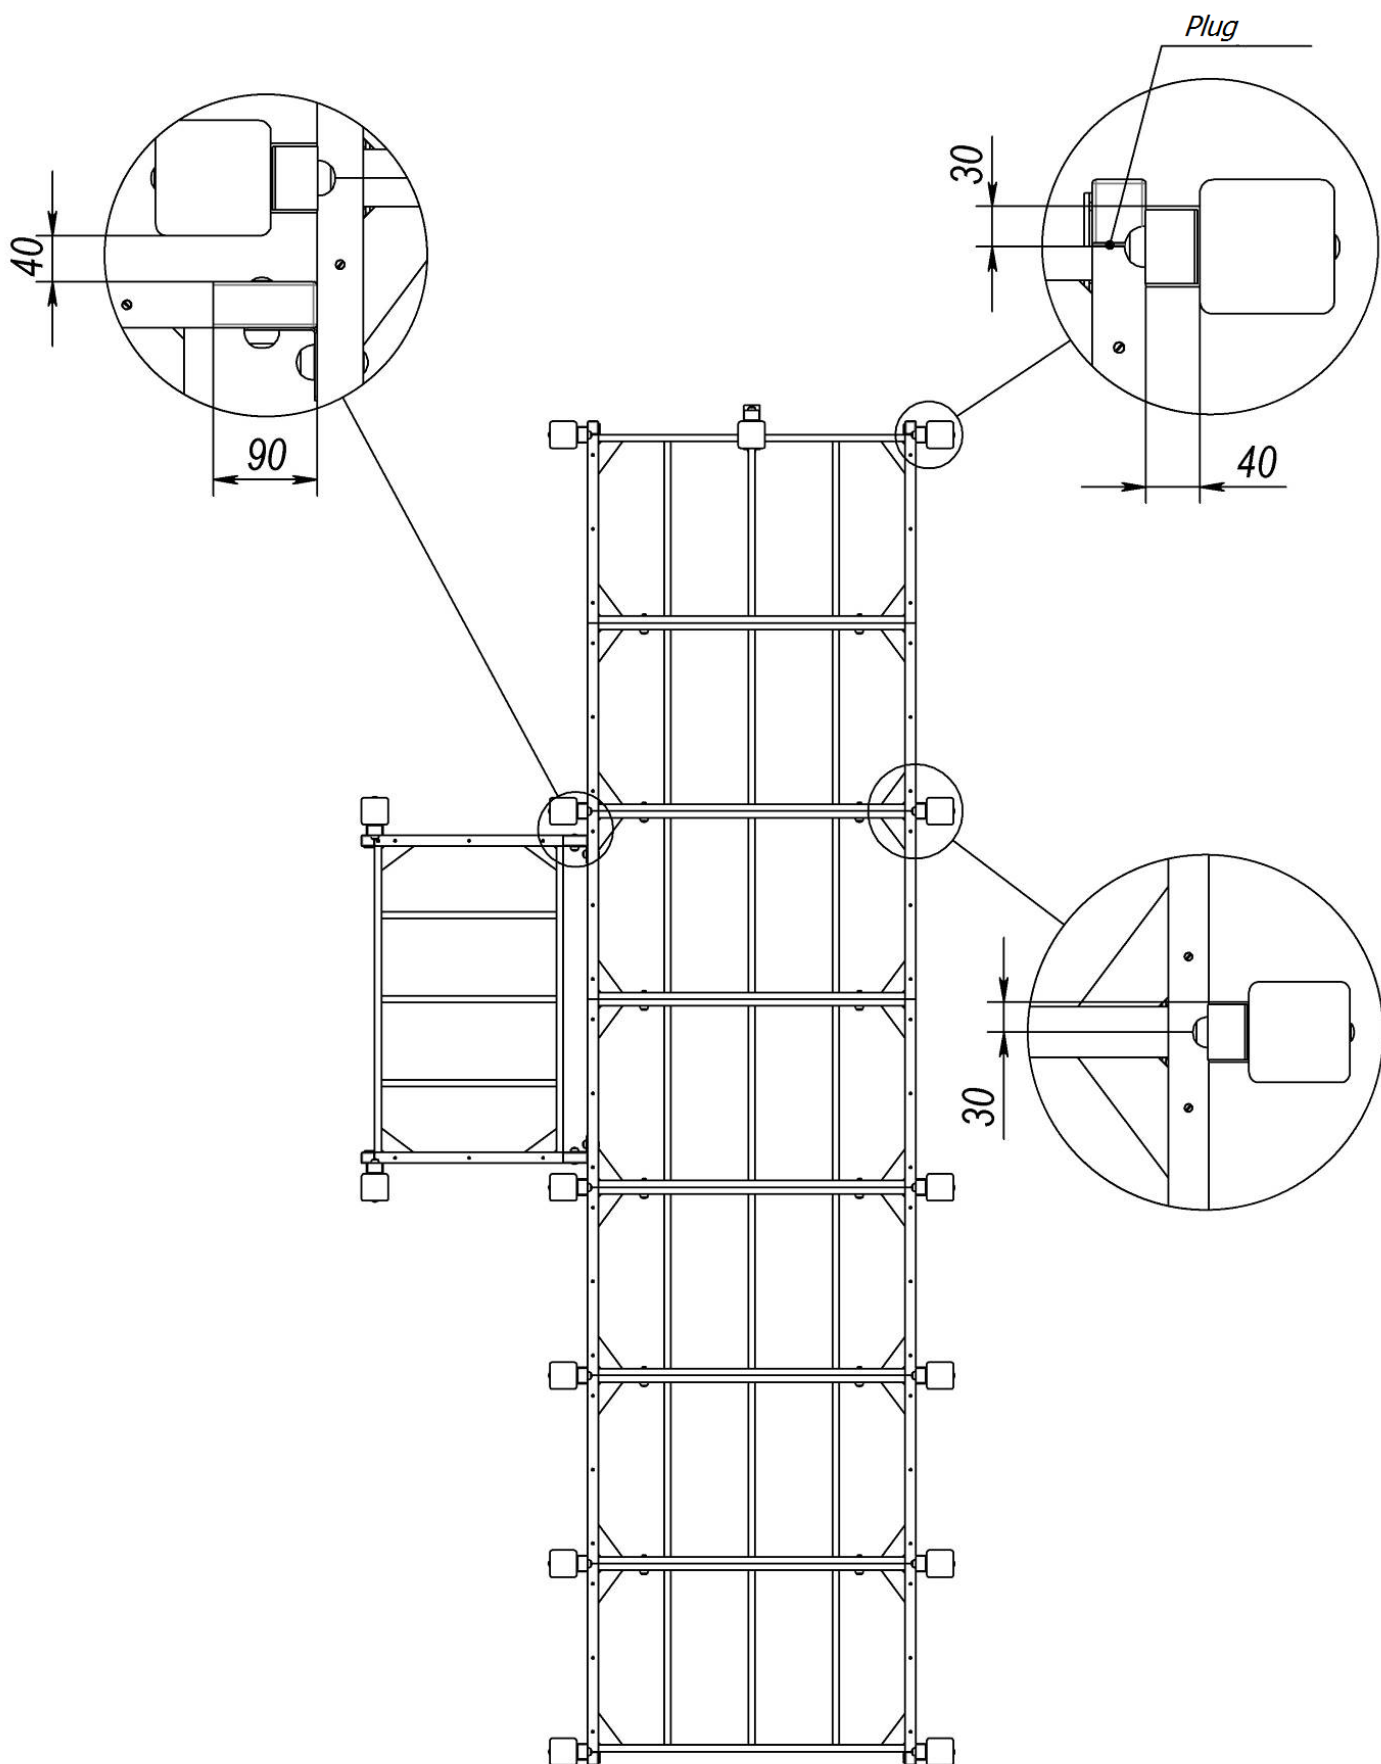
Additionally to (assembly schemes of supports and boards)
